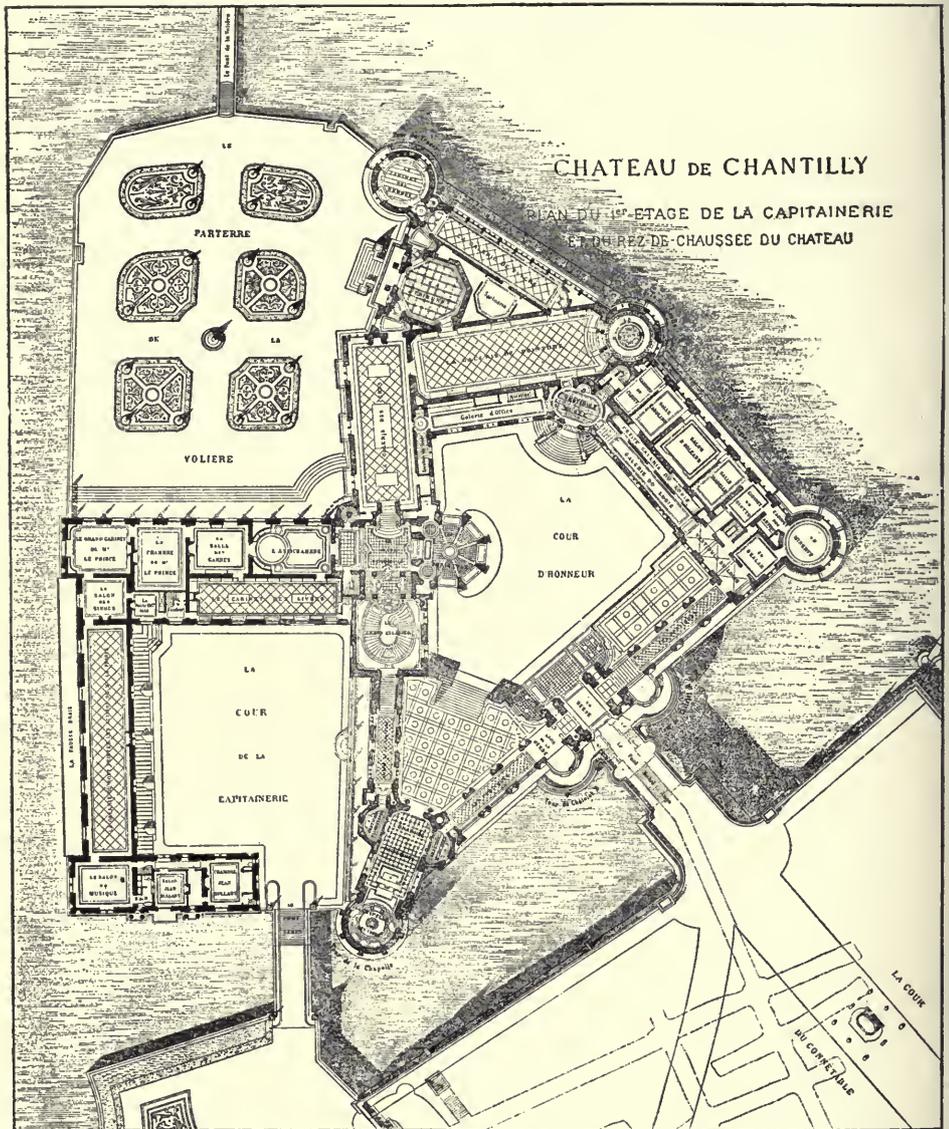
PLAN OF THE FIRST FLOOR OF THE PRESENT CASTLE OF CHANTILLY.
